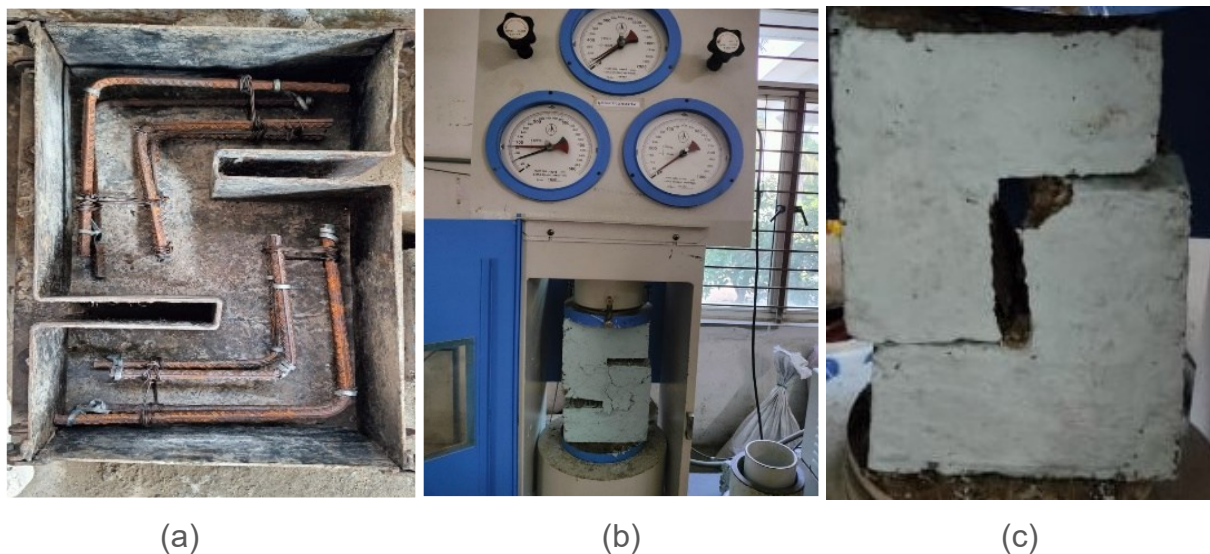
(a) reinforcement details of push-off specimen; (b) push-off specimen testing; (c) failure mode of specimen
